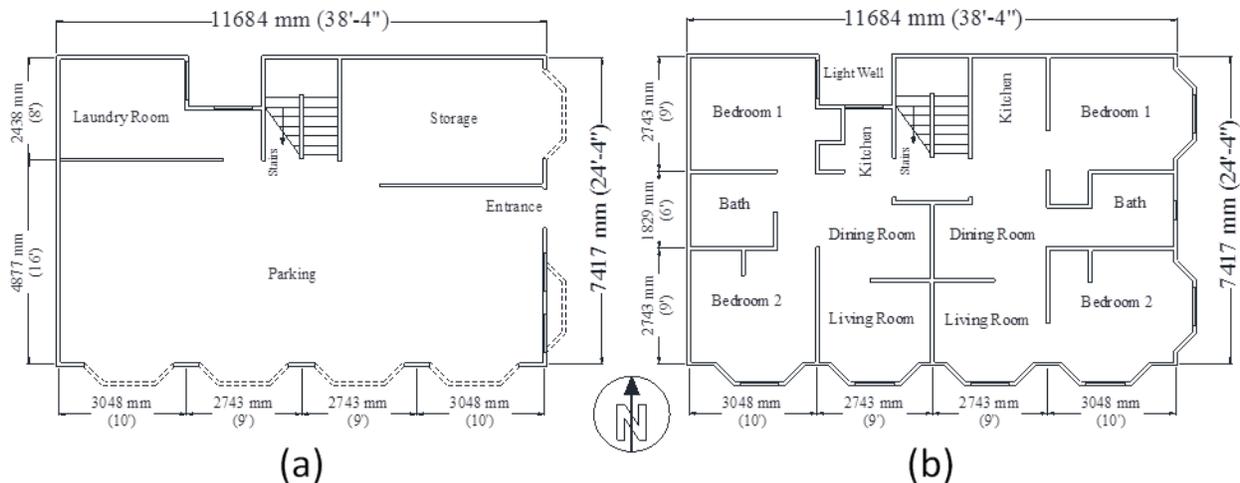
Floor Plans for the Four-Story Building: (a) Ground Story, (b) Upper Stories
